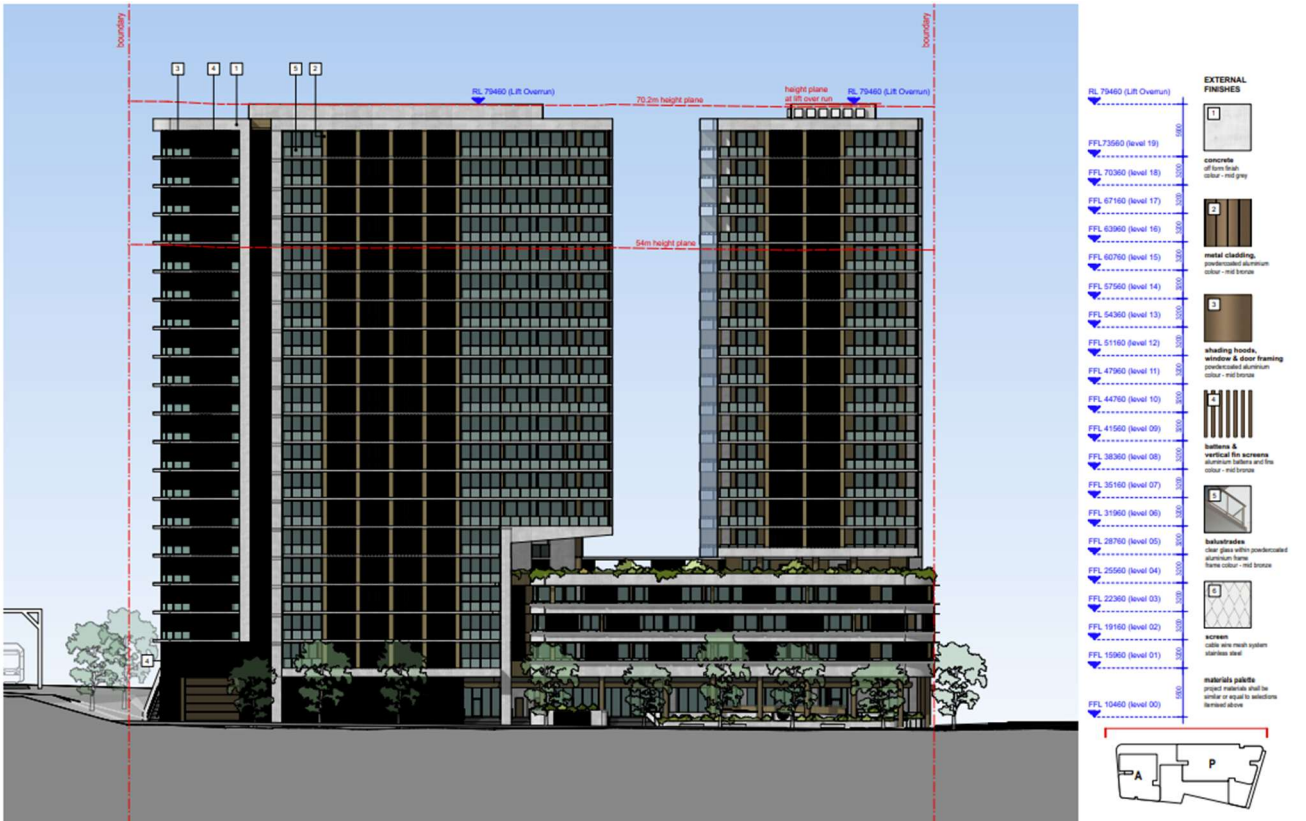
Extract of the proposed northwest elevation to Pilgrim Avenue.
